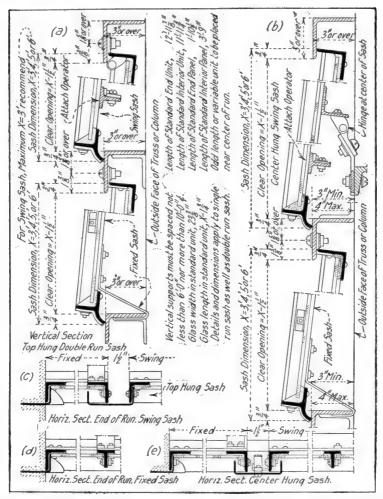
Details of "Lupton" Steel Monitor Ventilators and Skylights.
